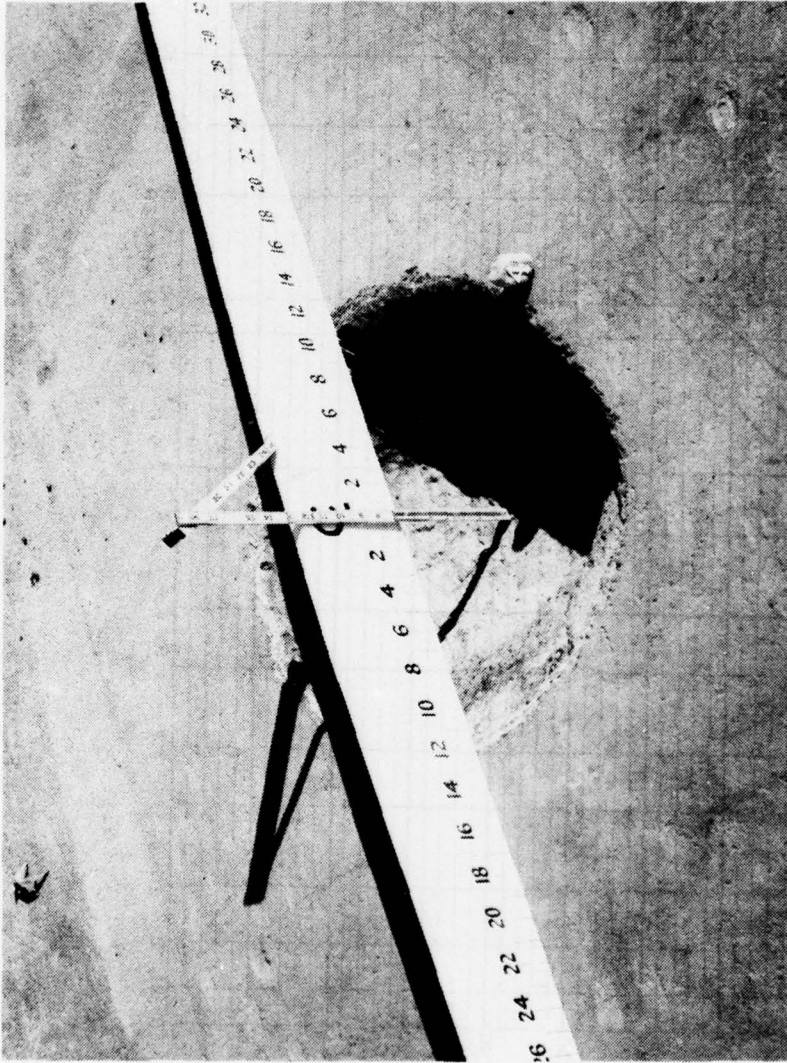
Typical 2-Foot-Diameter Area in Flexible Pavement
